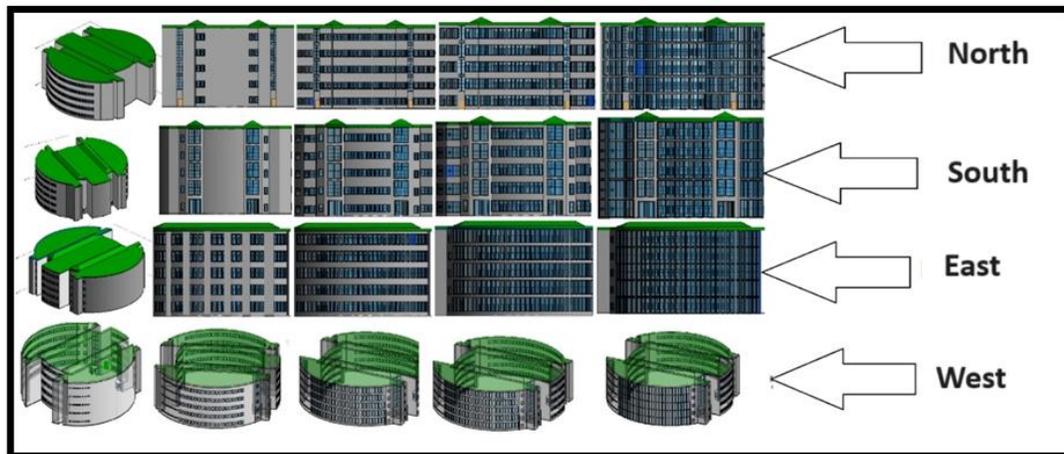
Images of sample trials on wall-window proportions in cylindrical shell
